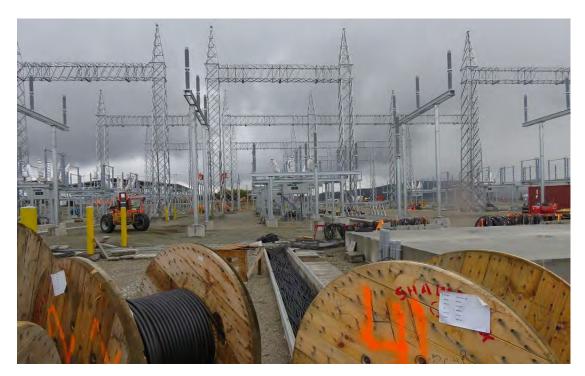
Bottom Brook – general view of completed structural steel in substation with cable duct in foreground.
